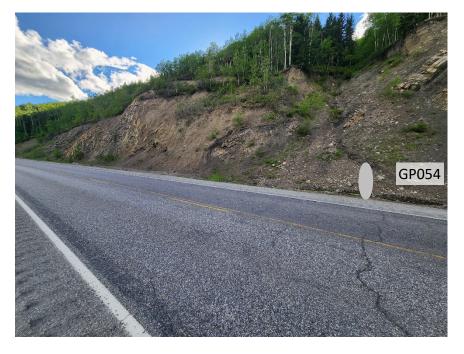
Rock slope along west side of Hwy 40:36. Note GP054 km 12.1 debris flow site on left and talus material mainly from coal seams in ditch. Photo taken June 10, 2024, facing northeast.
